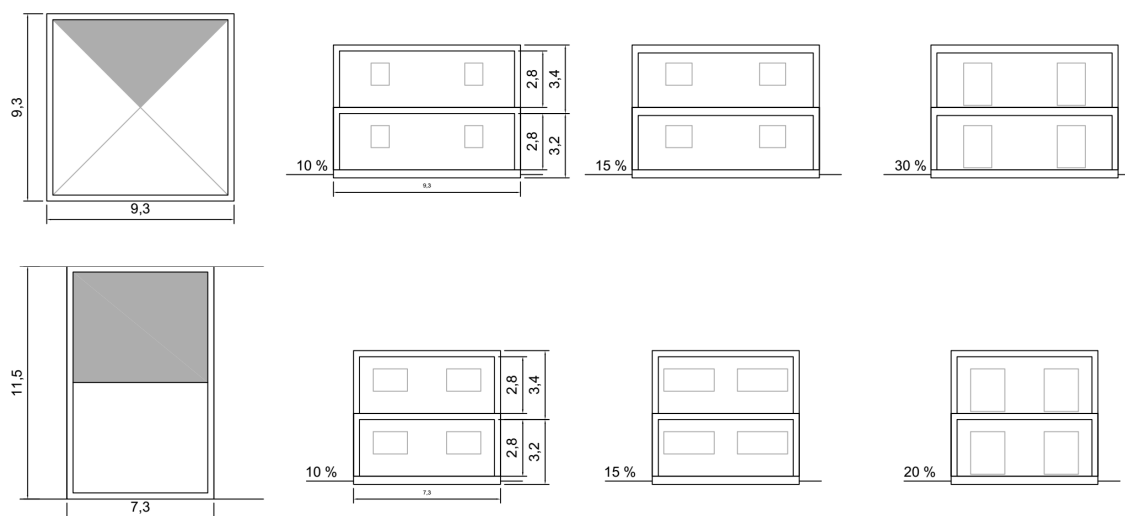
Plan and cross sections of the studied models with window to floor ratio.
